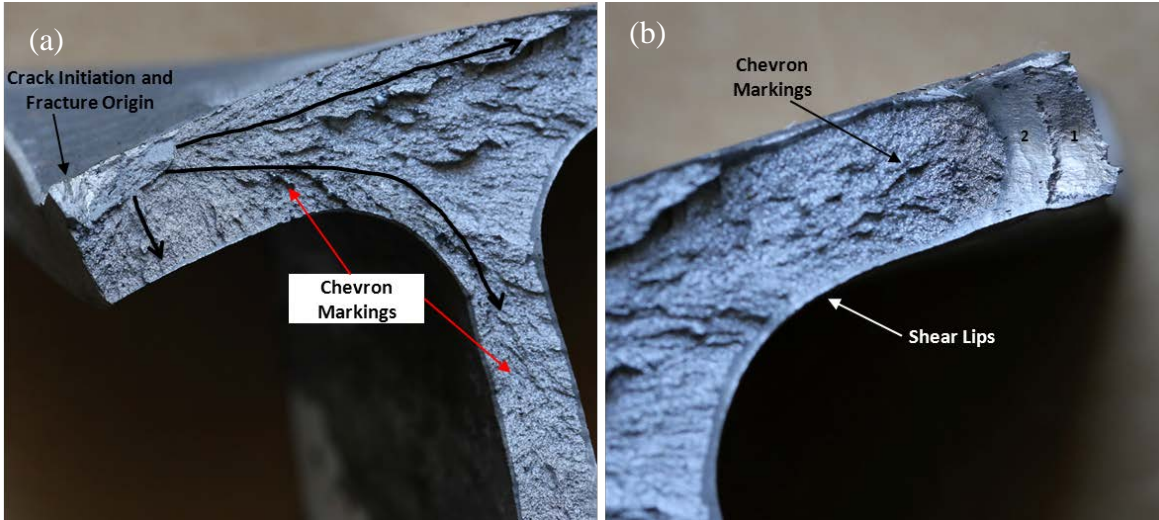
Close-Up of Crack Initiation and Fracture Origin with Chevron Marking Pointing Back to the Fracture Origin Due to the Brittle Overload Fracture Mode (a) and Close-Up of Striation Locations at the other Side with Chevron Markings Pointing Back to the Fracture Origin (b)
